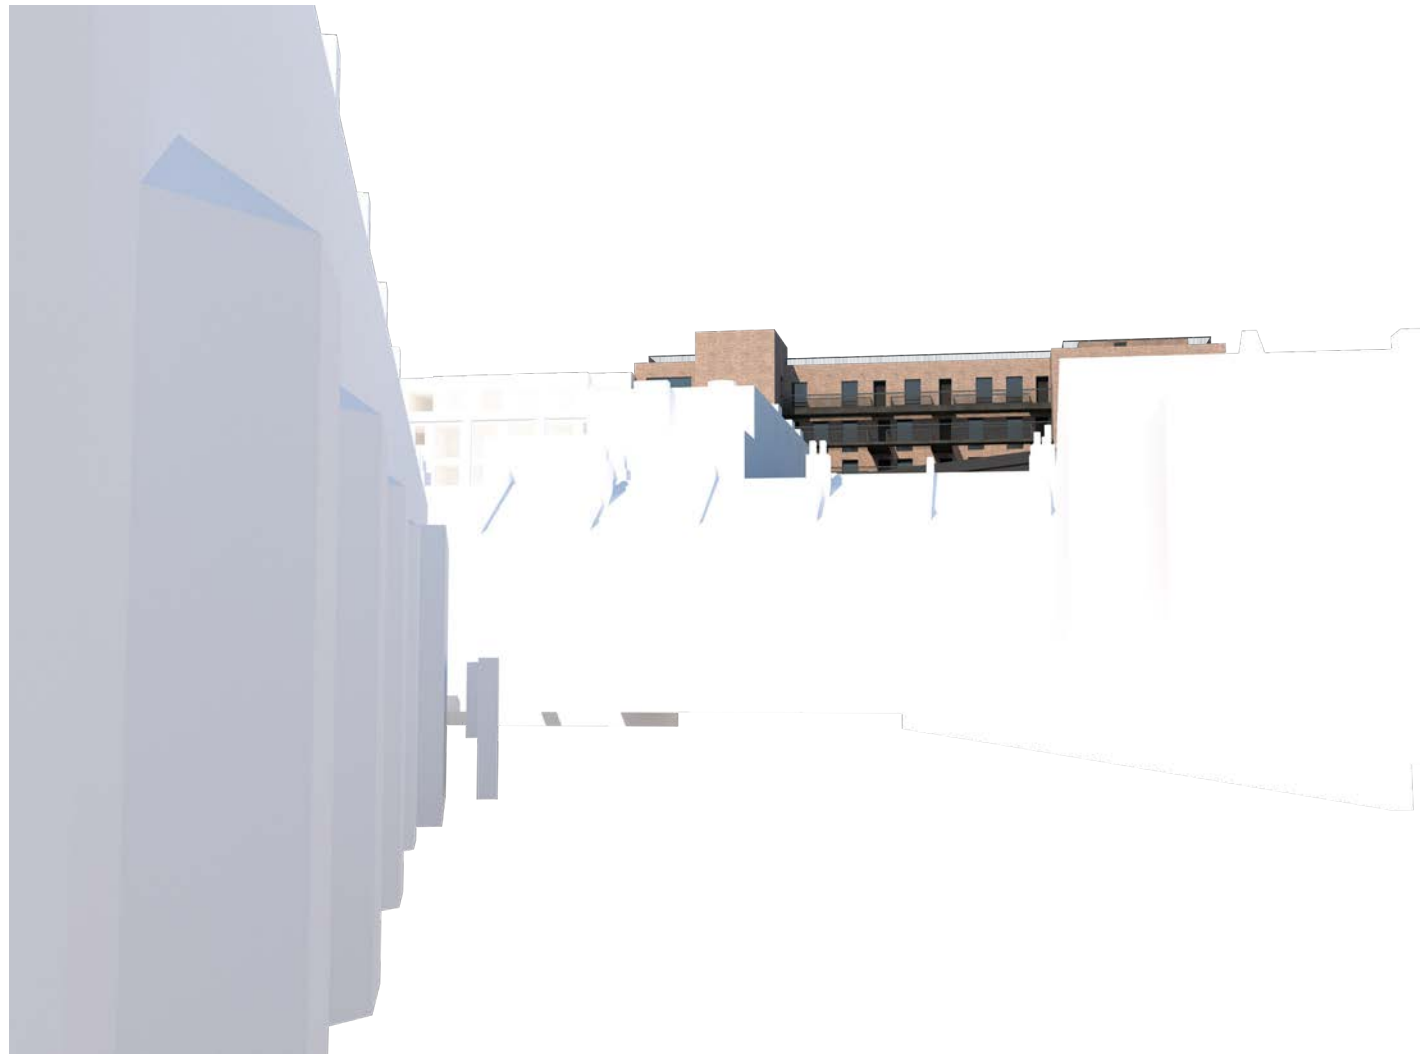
View 02 Nelson Road (image from boehm lynas Architects)
